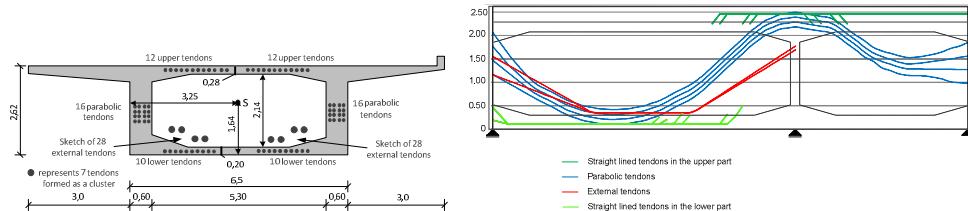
Cross section of the box girder with the description of the tendons (left) and longitudinal schematic view of the prestressed tendons (right)
